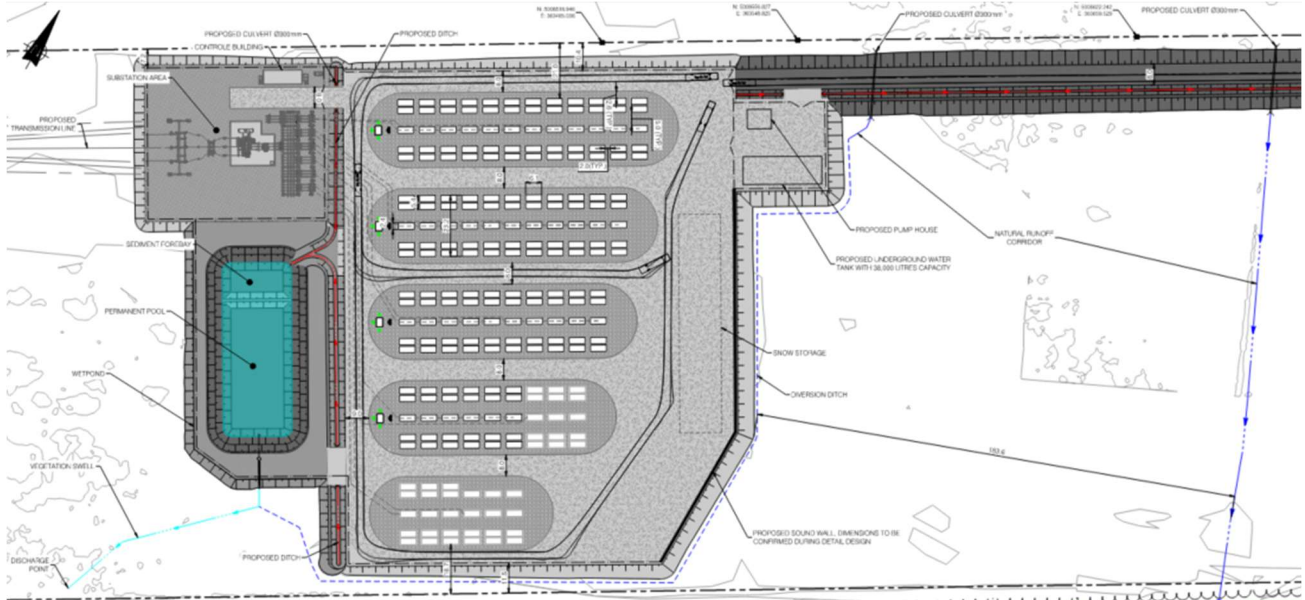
above is the preliminary site grading plan for the Trail Road BESS Site
